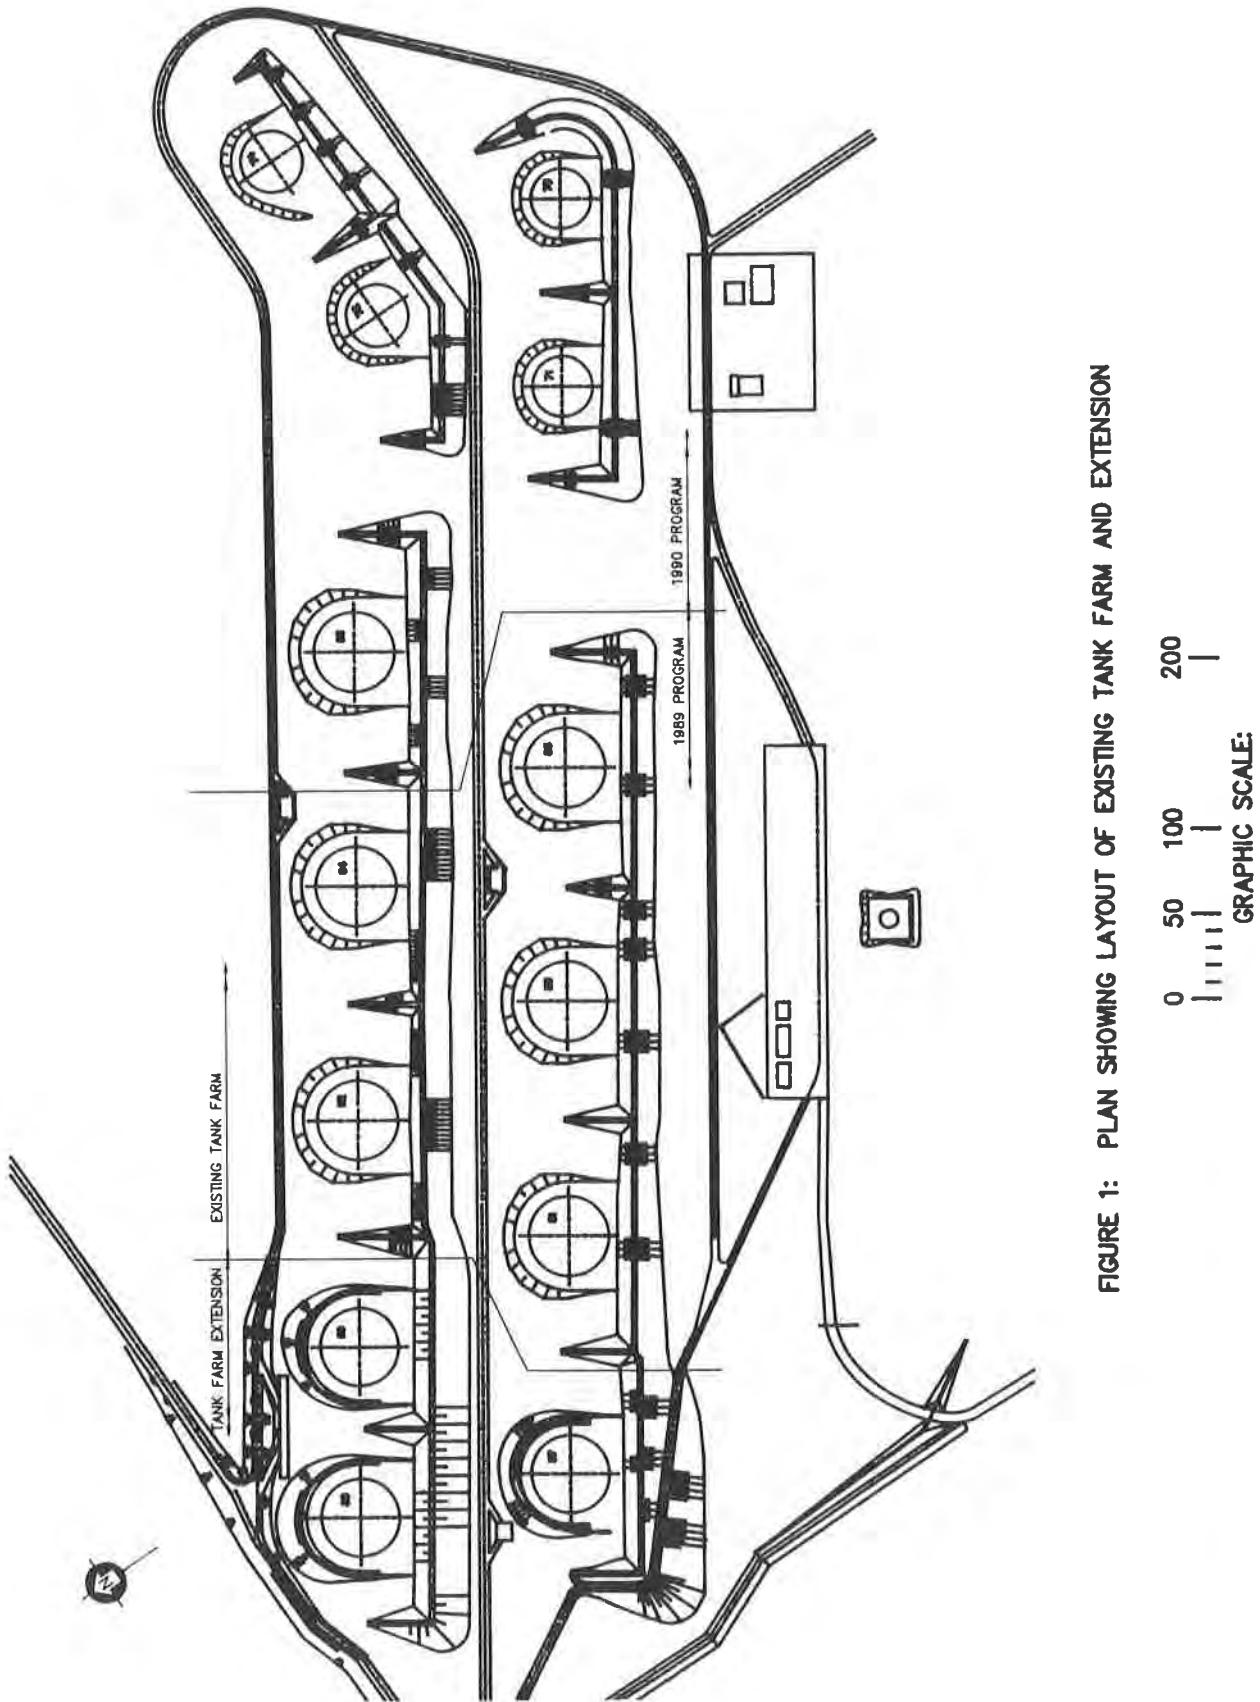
PLAN SHOWING LAYOUT OF EXISTING TANK FARM AND EXTENSION
